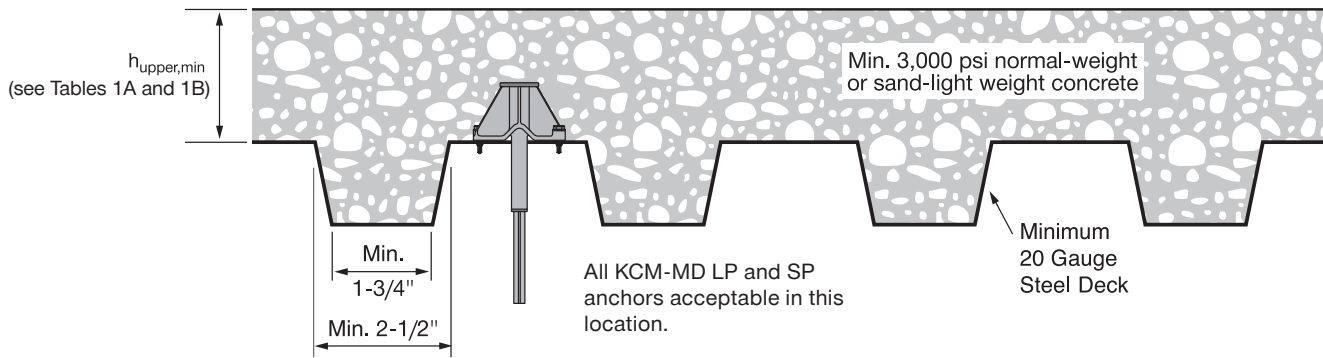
A —Installation in the soffit of concrete filled metal deck floor and roof assemblies-over upper flute (B-deck and W-deck)
